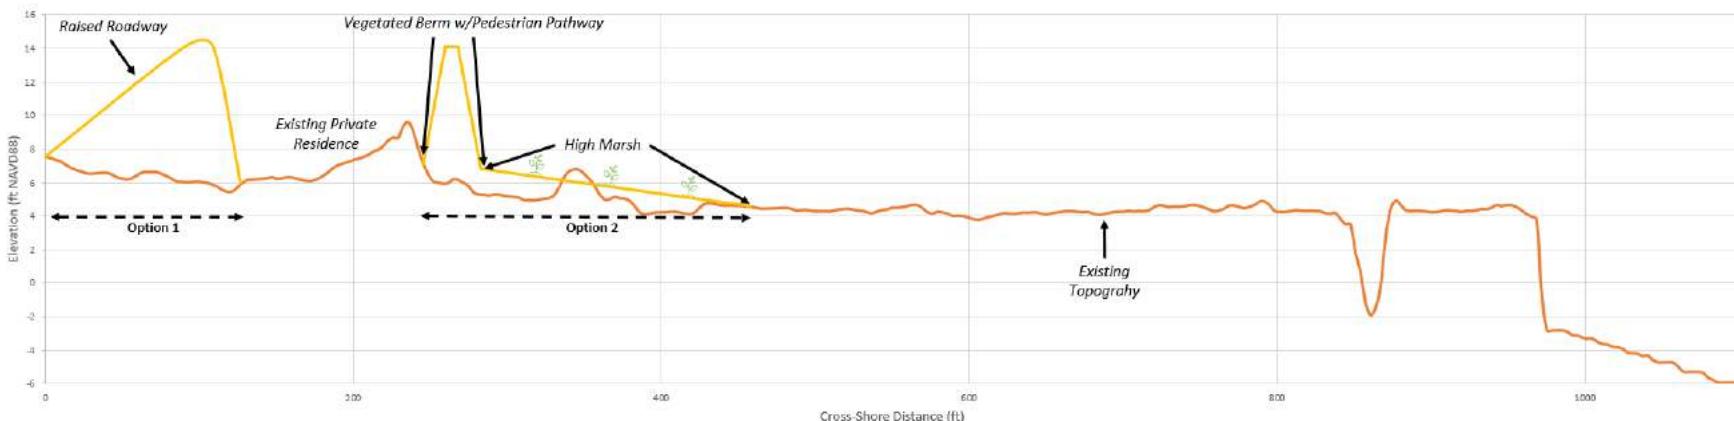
Banks St – Living Levee and Raised Pathway or Raised Roadway Conceptual Cross-Section (XS-2).
